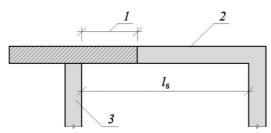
The length of the transverse wall fragment, which can be assumed as the stiffening wall: 1 - a fragment of a transverse wall contributing with a stiffening wall of length $b_{\rm eff1}$, $2 - {\rm transverse \ wall}$, $3 - {\rm stiffening \ wall}$
